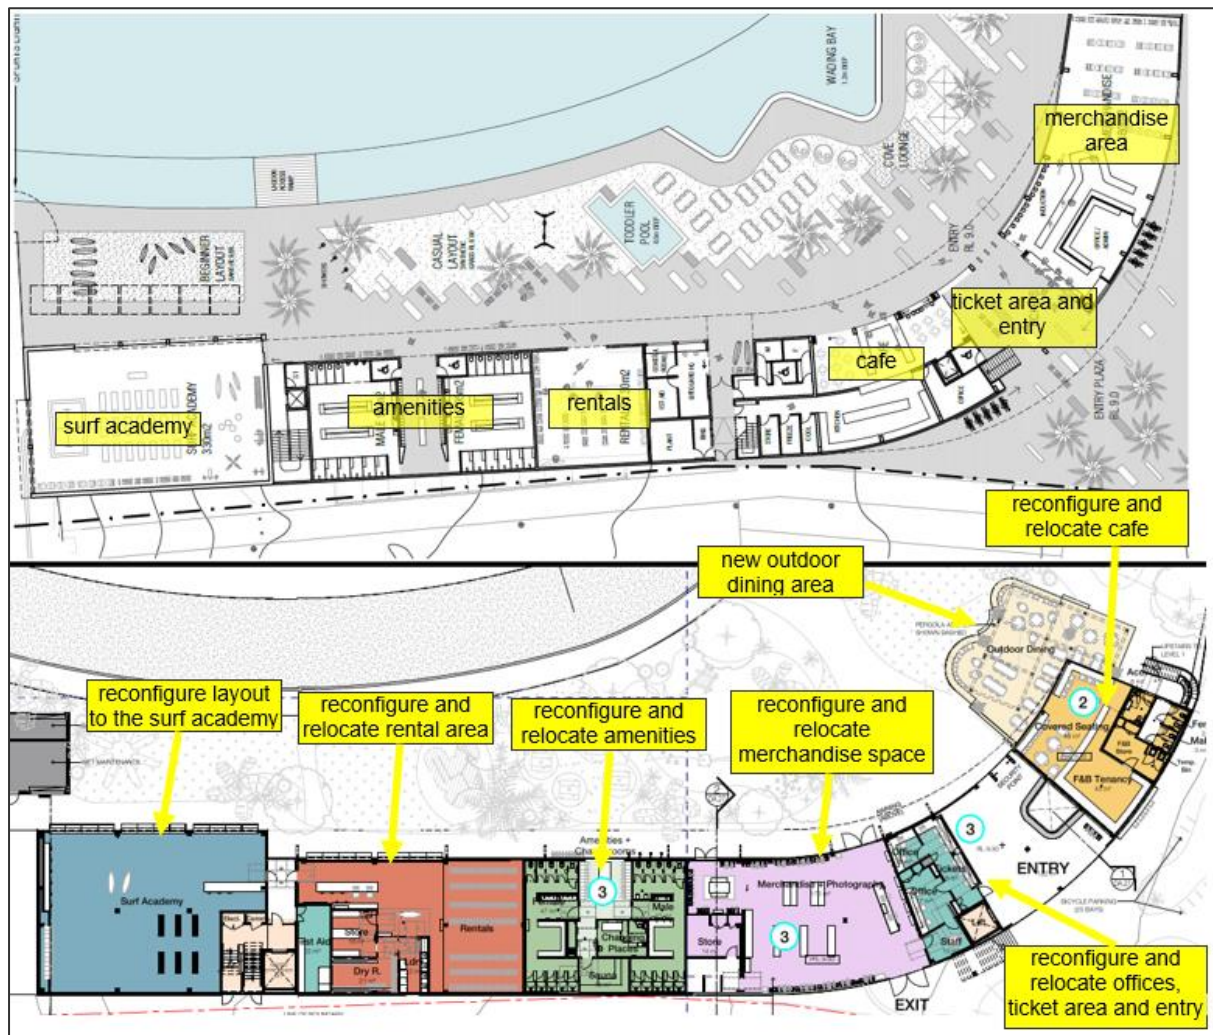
| The approved ground floor plan and (top) and proposed (bottom) (base source: Modification Report)
